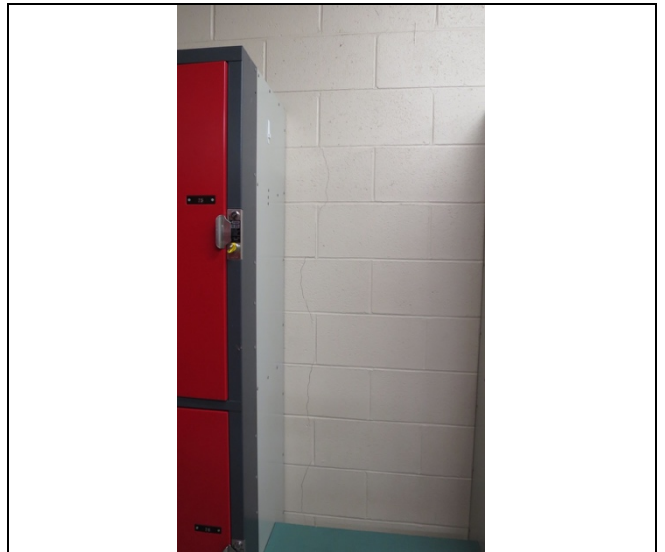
A1031 Crack in CMU at GL's 9.1 & M
